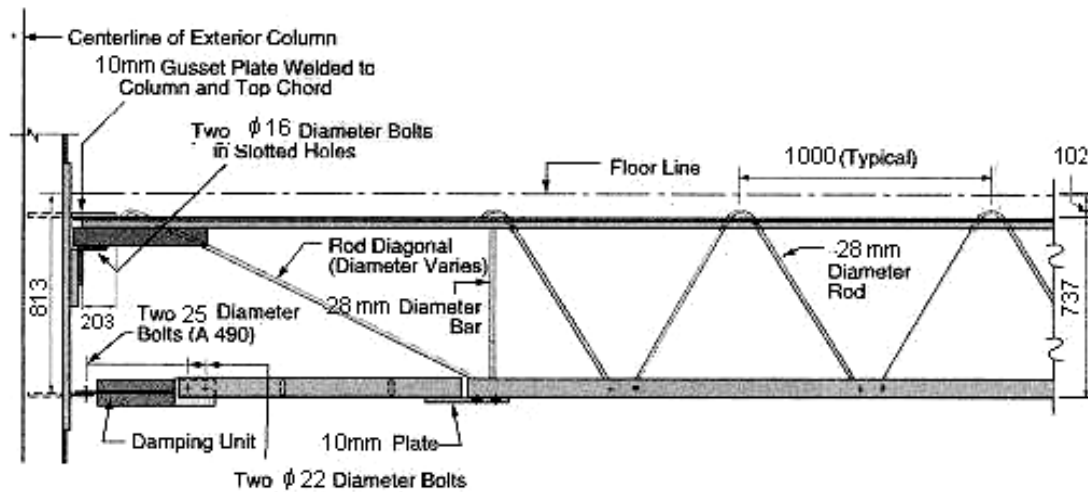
Truss - Exterior wall end detail (FEMA, 2002)
